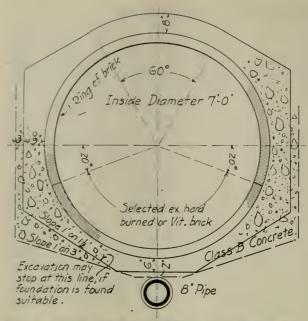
PLAIN CONCRETE SEWER, ROCHESTER, N. Y.
